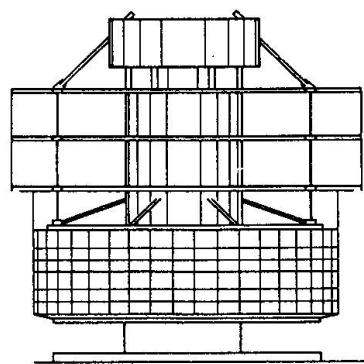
Project: suspension building of the Bayerische Rückversicherung
